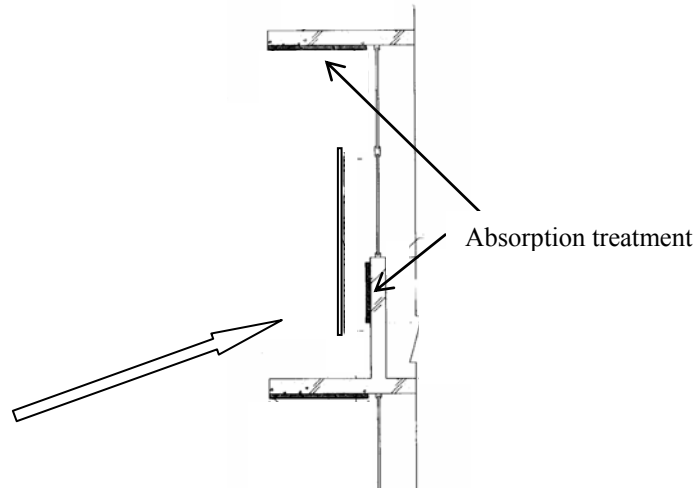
Sectional drawings showing the sound direction and classroom facade at Yunshulin Elementary School.
